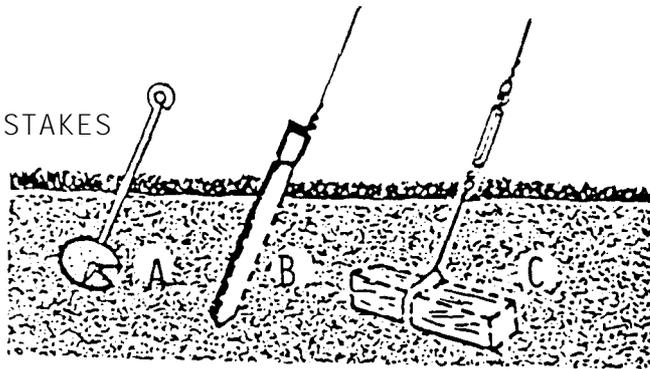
GUYING FOR SUPPORT AND ANCHORAGE
